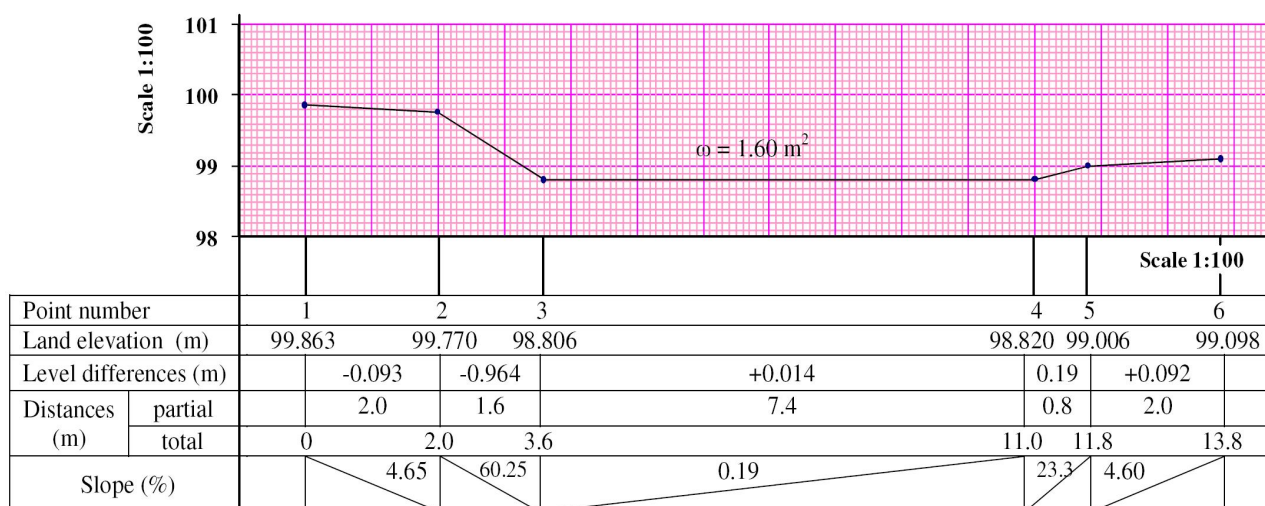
Longitudinal section CC1 channel upstream and downstream of the culvert blocked
